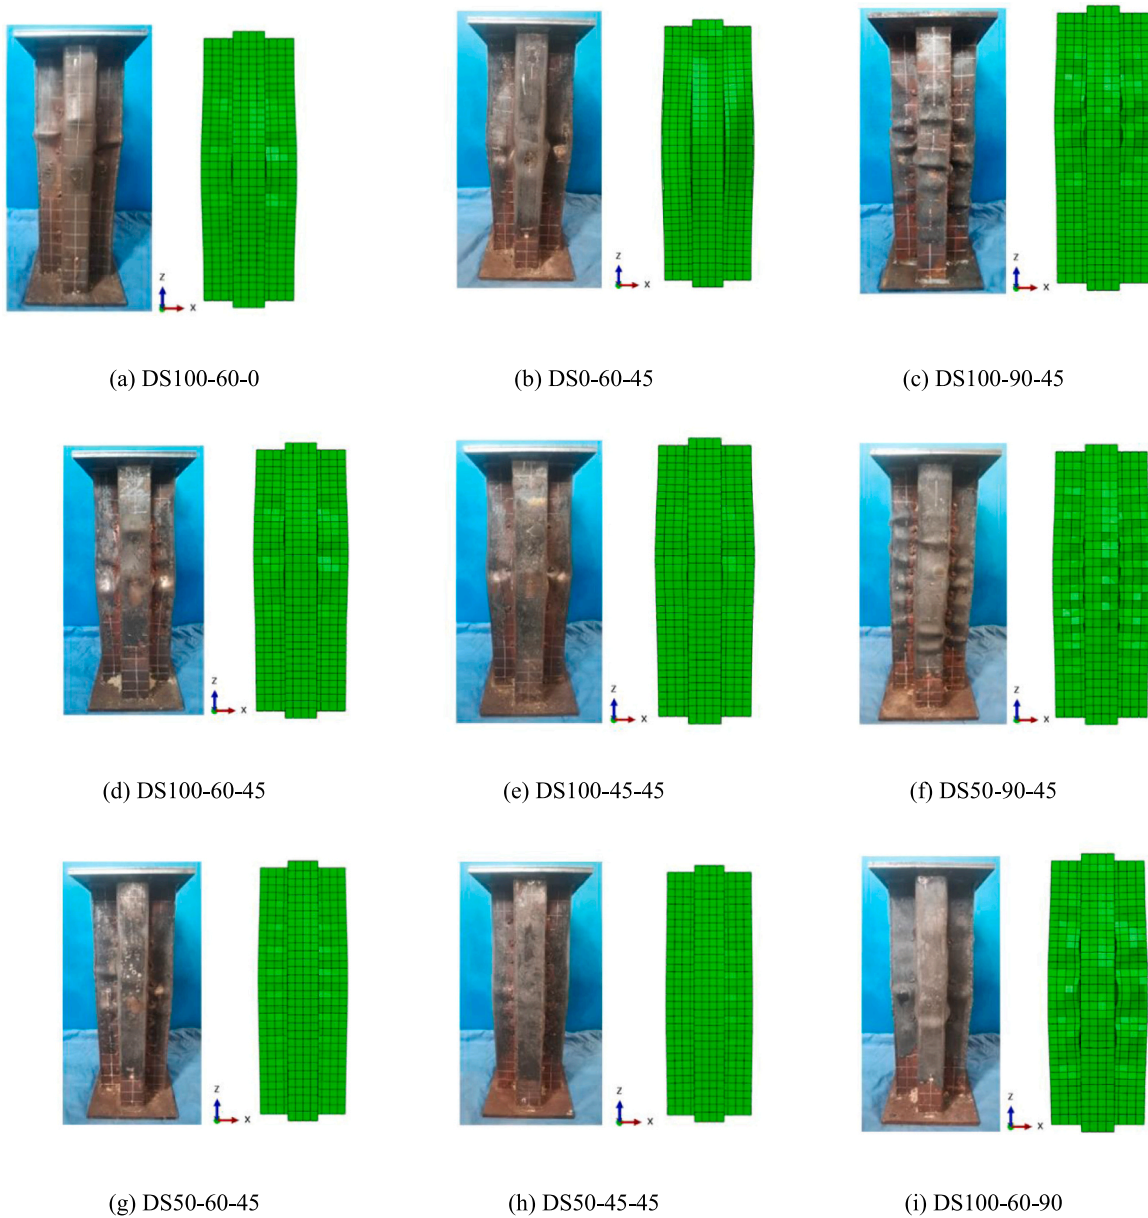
Failure mode of cross-shaped stiffened concrete-filled steel tubular stub columns after fire exposure.
